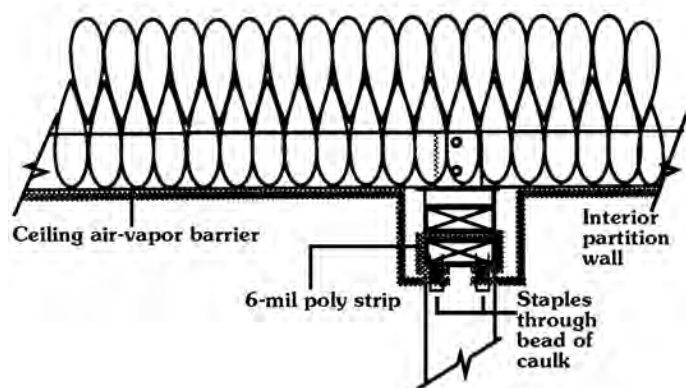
Placing a strip of polyethelene between the top plates of an interior wall, to be sealed to the rest of the ceiling air-vapor barrier.
